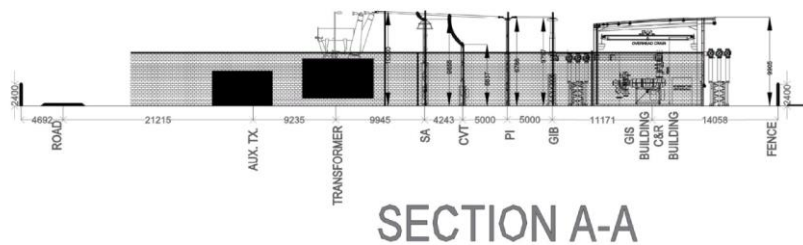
Sunnica West Site A Substation Elevation – 400kV solution (illustrative)
